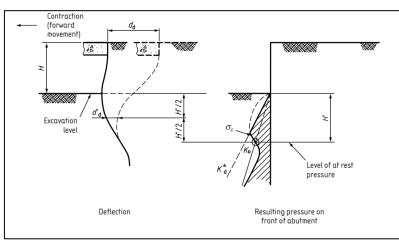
Earth pressures applied to the front of abutment (contraction case)^[6]
